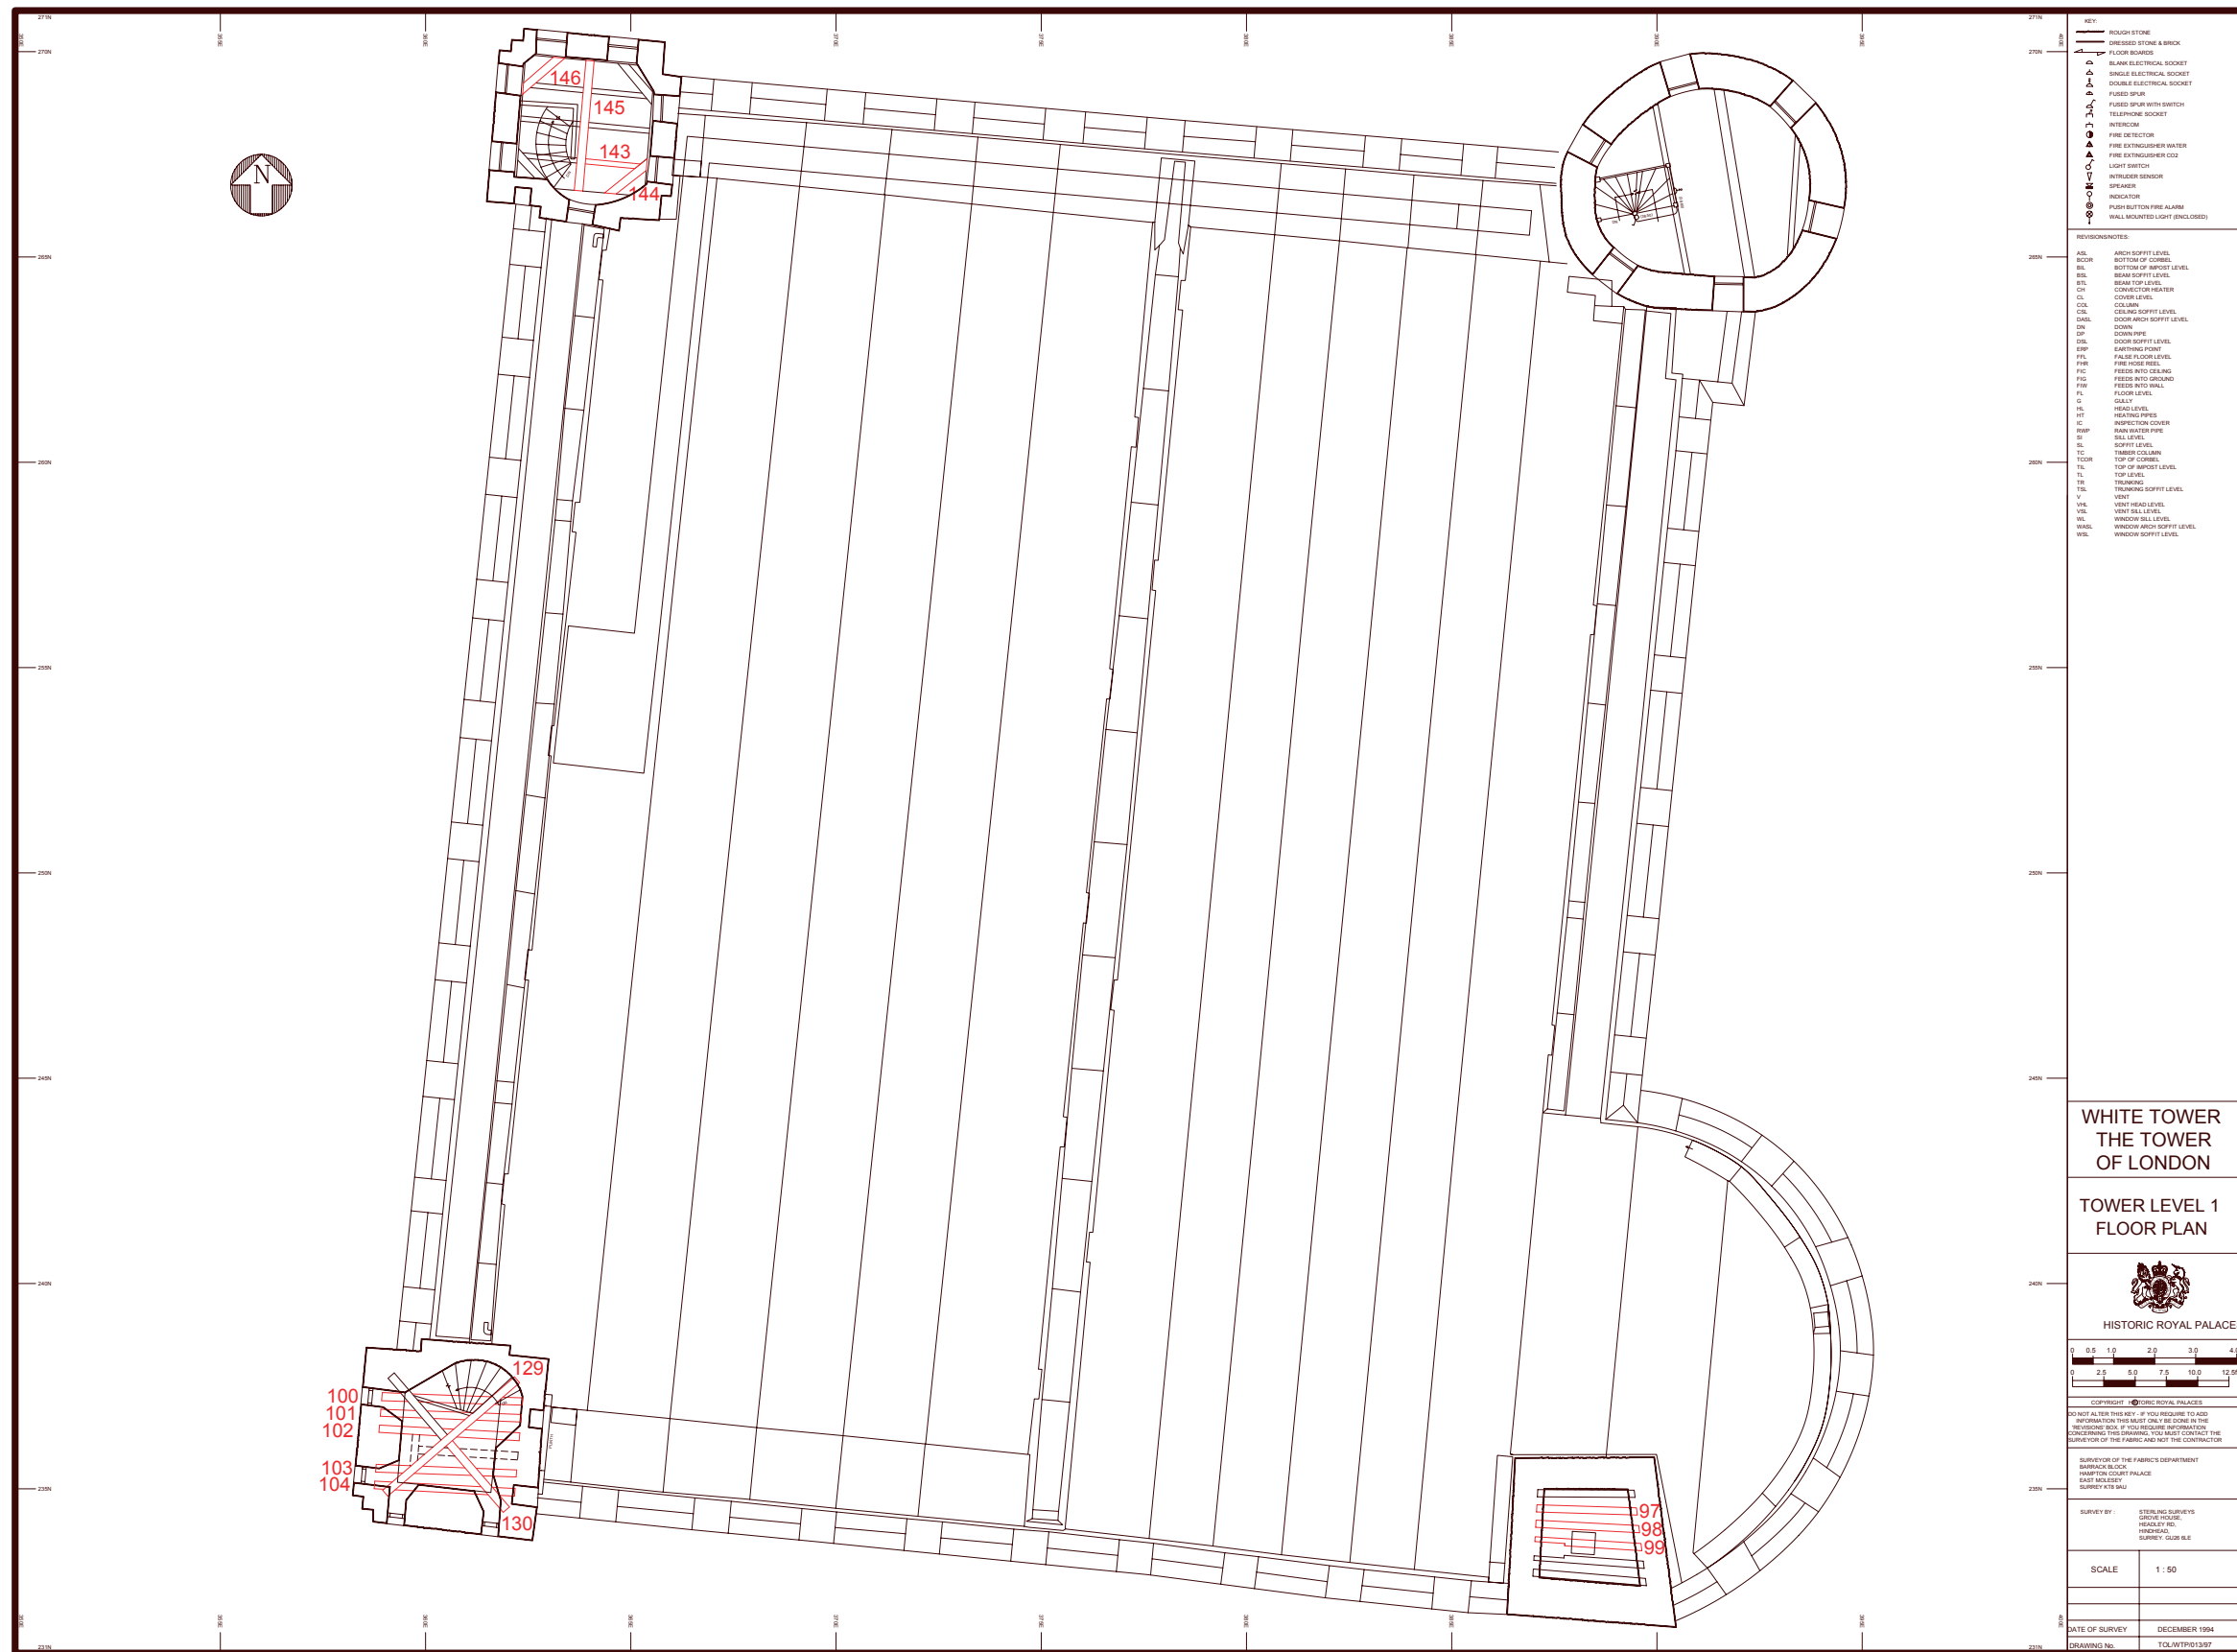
Plan of first-floor level of turrets showing locations of timbers sampled (after Historic Royal Palaces)
